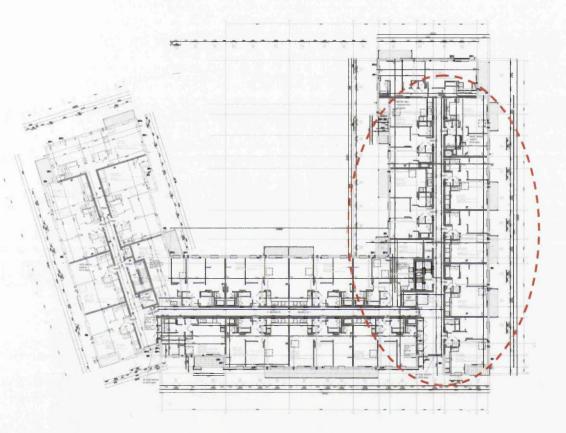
CAD Floor plan courtesy of SCS Group [95].
